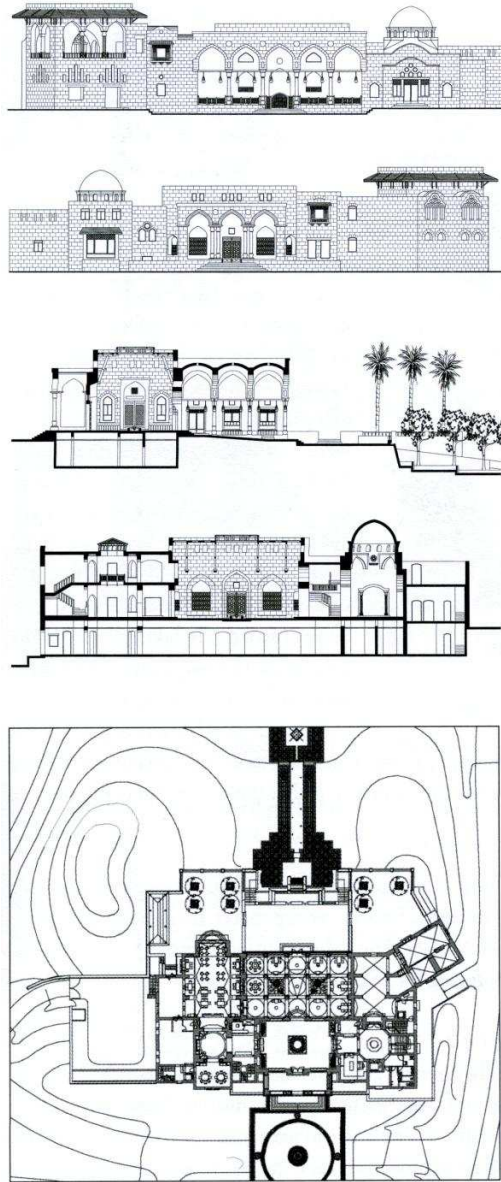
24. Elevations, sections and plan of the Hilltop Restaurant [source: (Rashti, 2004, p. 161)]
